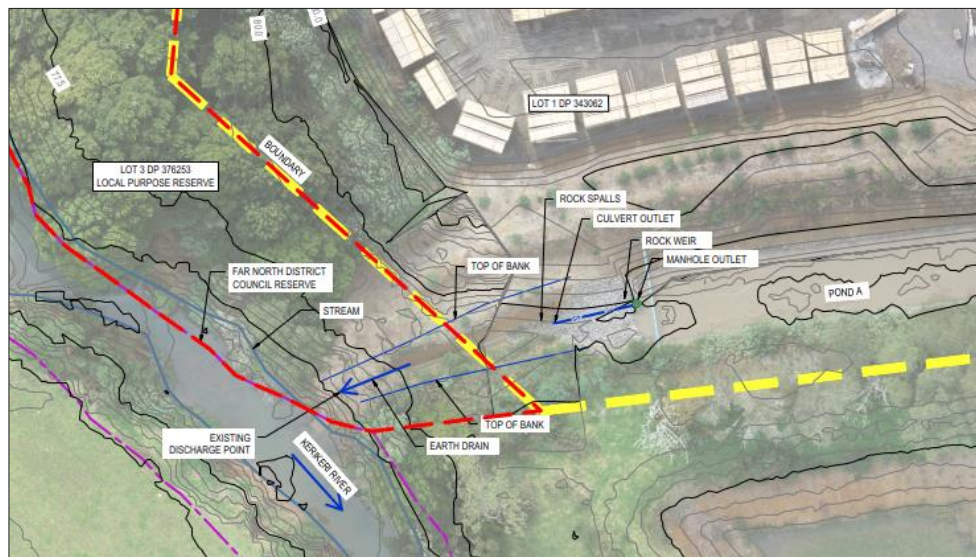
Plan showing the stormwater discharge (Source: Haigh Workman)
